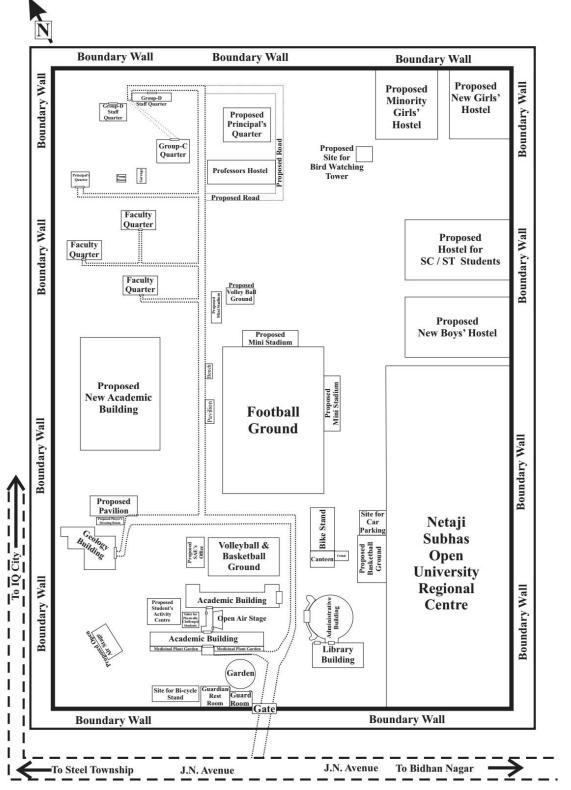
Master Plan including the proposed plan of the college campus [Proposals for indicated areas has already been sent to Government of West Bengal) for approval
